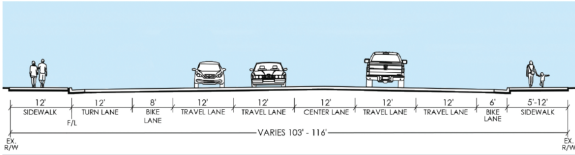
SERVICE ROAD (ALONG HIGH SCHOOL FRONTAGE)
